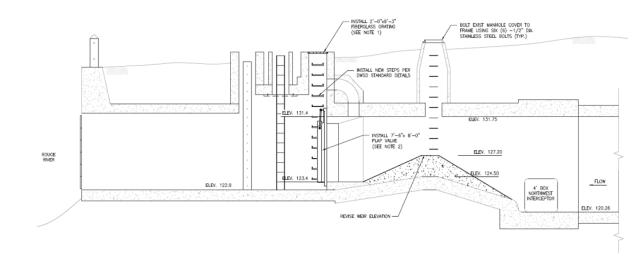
Section Through Six Mile Relief CSO Outfall
